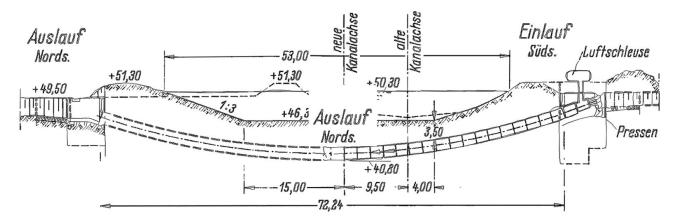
Longitudinal section of an inverted syphon crossing another waterway and a road (source unknown)
